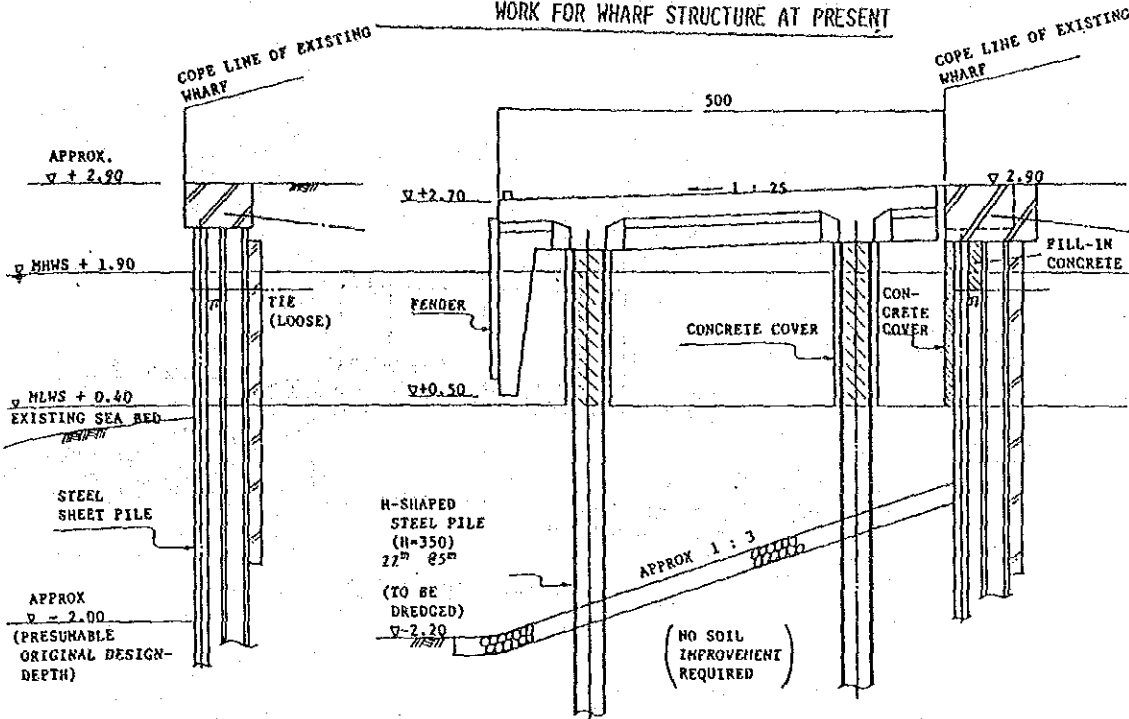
, TYPICAL SECTION OF FINGER JETTY
